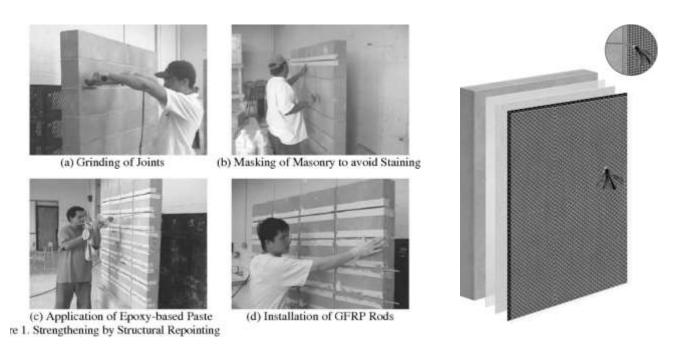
Strengthening of Masonry Walls using FRP Structural Repointing
